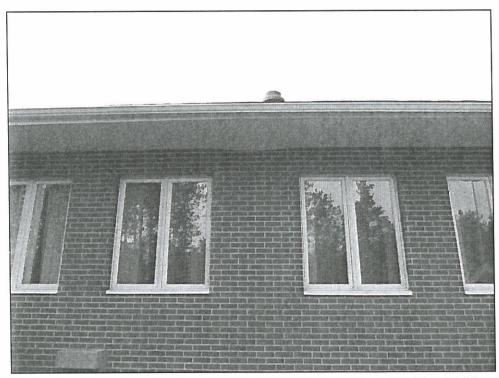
Three Foot Section of Damages Soffit at South Side of the Addition
